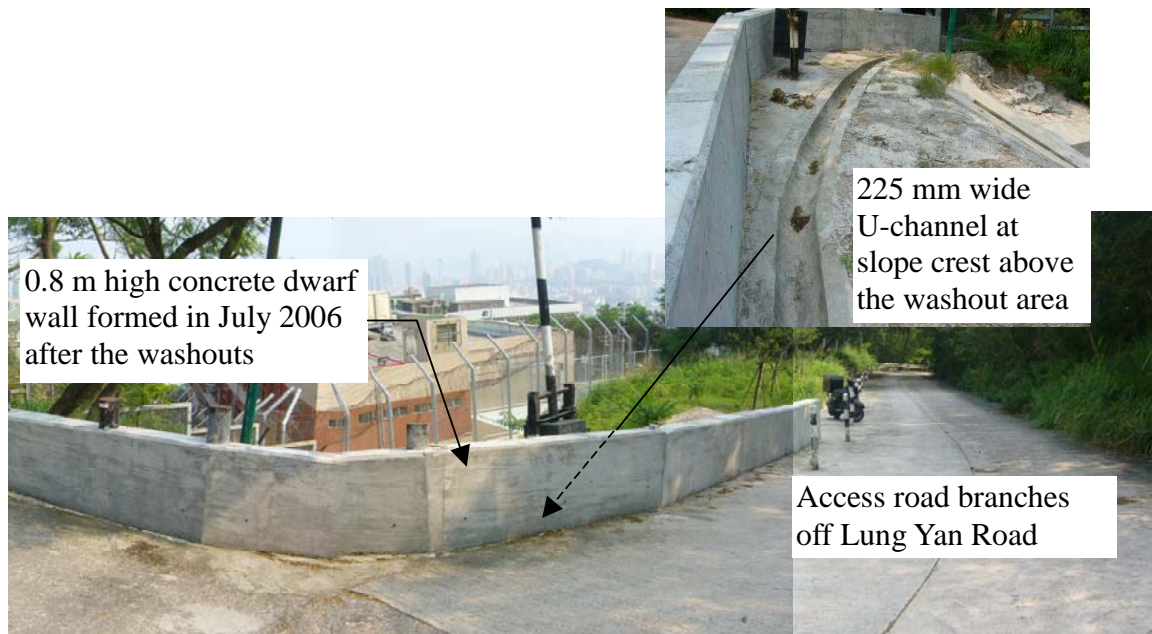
View of Access Road to the West of Slope No. 11NW-B/FR60 and Concrete Dwarf Wall Constructed after the July 2006 Washout Incident (Photograph taken on 20 September 2006)
